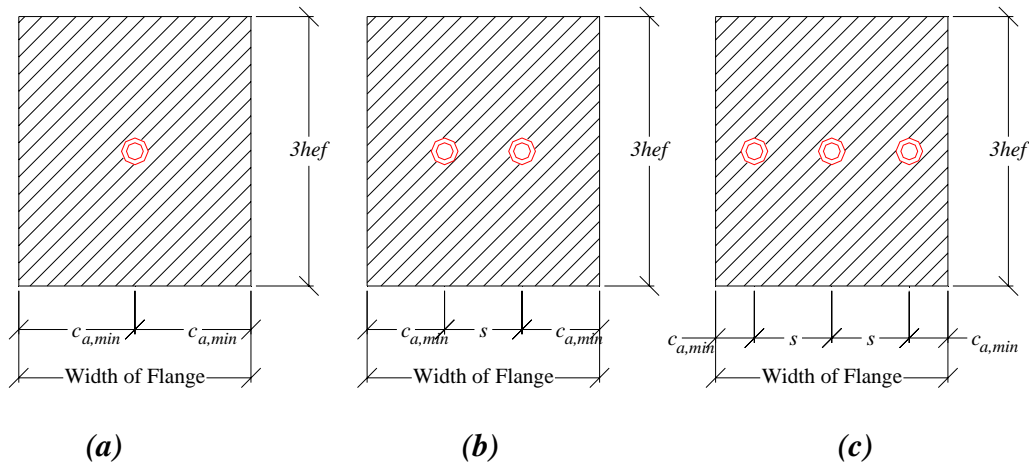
Assumed projected concrete failure area of studs for specimens with a 3-in. haunch and (a) one stud, (b) two studs, and (c) three studs
